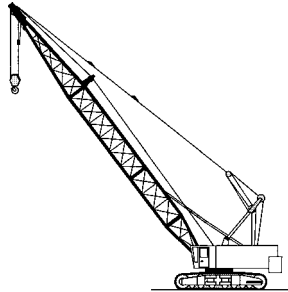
Crawler-mounted lattice boom crane. (Crane Institute of America, Inc.)
